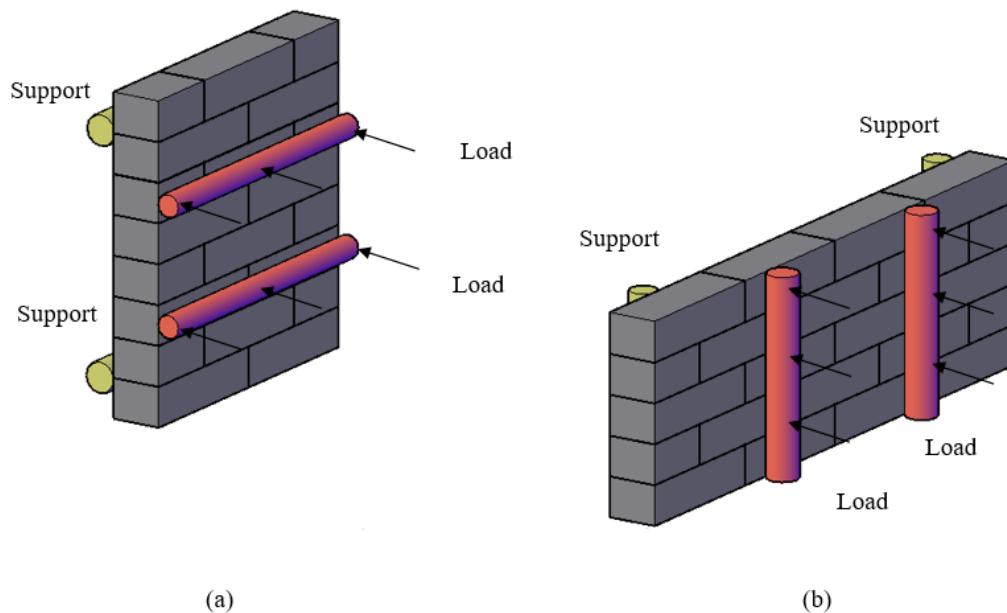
Testing arrangement of four-point loading on wallettes: (a) plain of failure parallel to bed joints, and (b) plain of failure normal to bed joints
